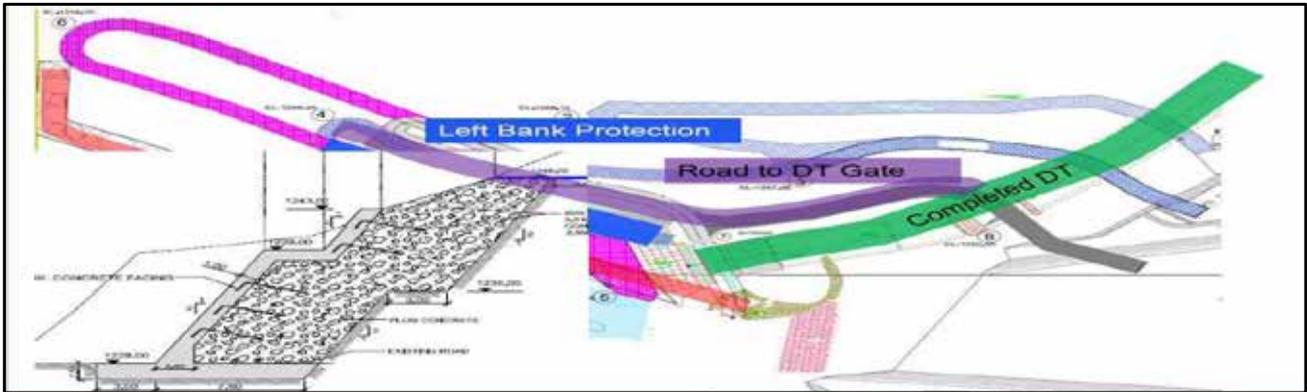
Left Bank of Diversion Tunnel Inlet Cut and Cover Protection Work
